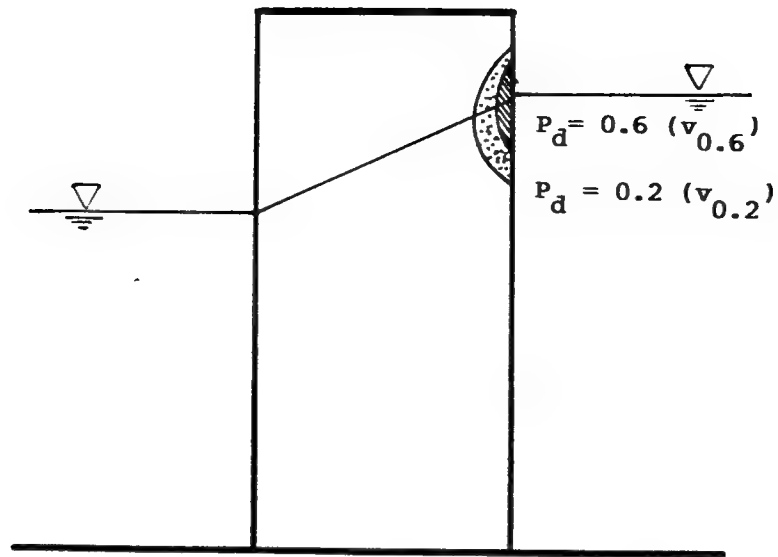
Concrete wall subjected to freeze-thaw damage
